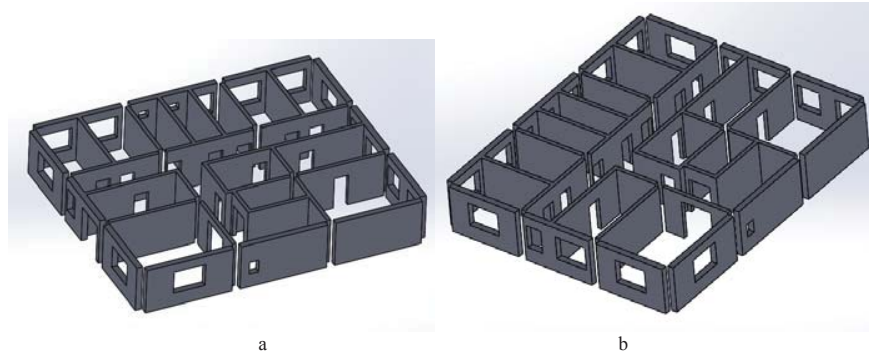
The building brickwork structures: a) first floor; b) second floor
